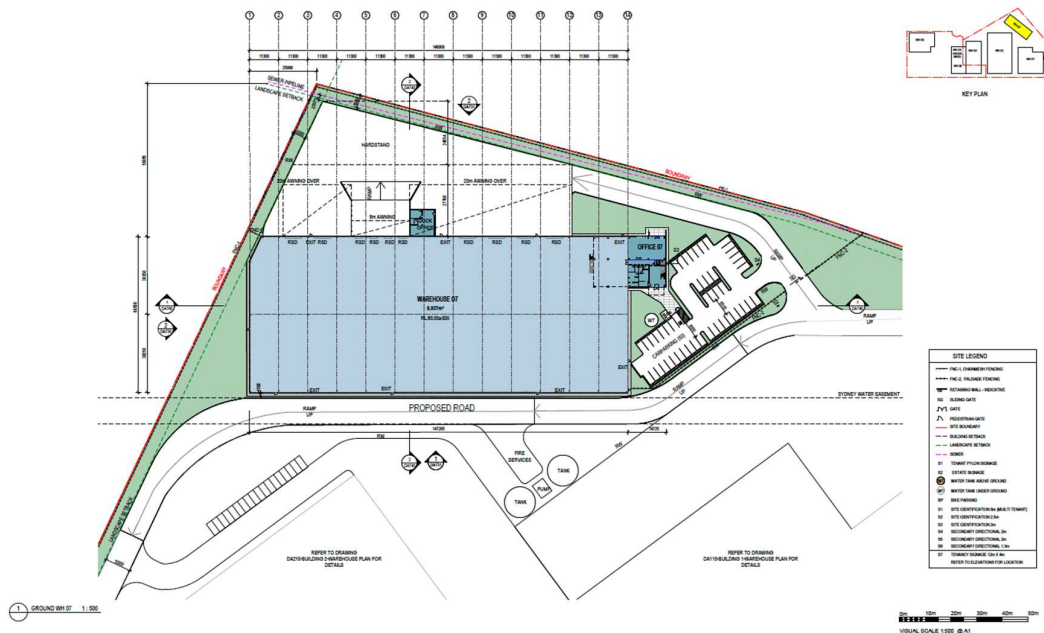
Approved Lot 7 Plan (Source: SBA Architects)
